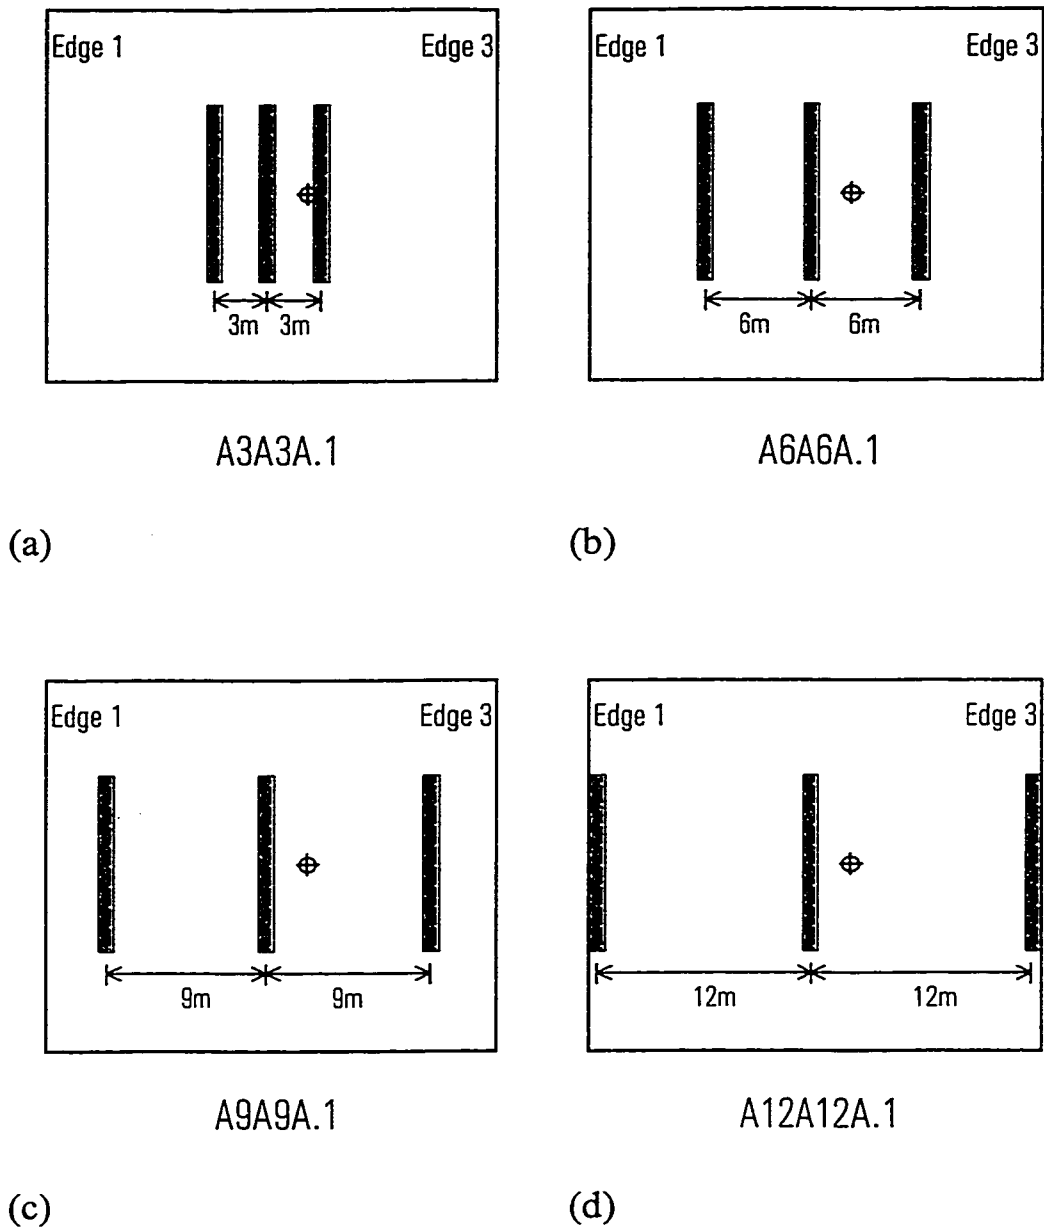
Four plan configurations for the seven-storey buildings;
